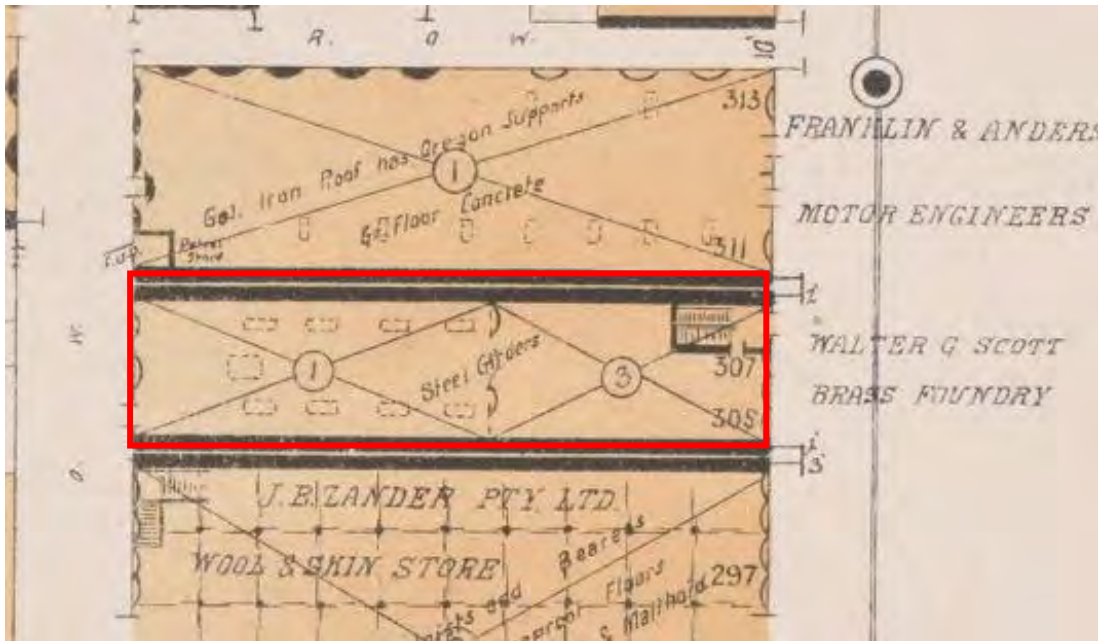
Detail from 1923 Mahlsted plan shows the property at 307-309 (originally 305-307) as a three-storey building with single-storey rear addition. (Source: Mahlsted Map Section 2, no 1a, 1923)
